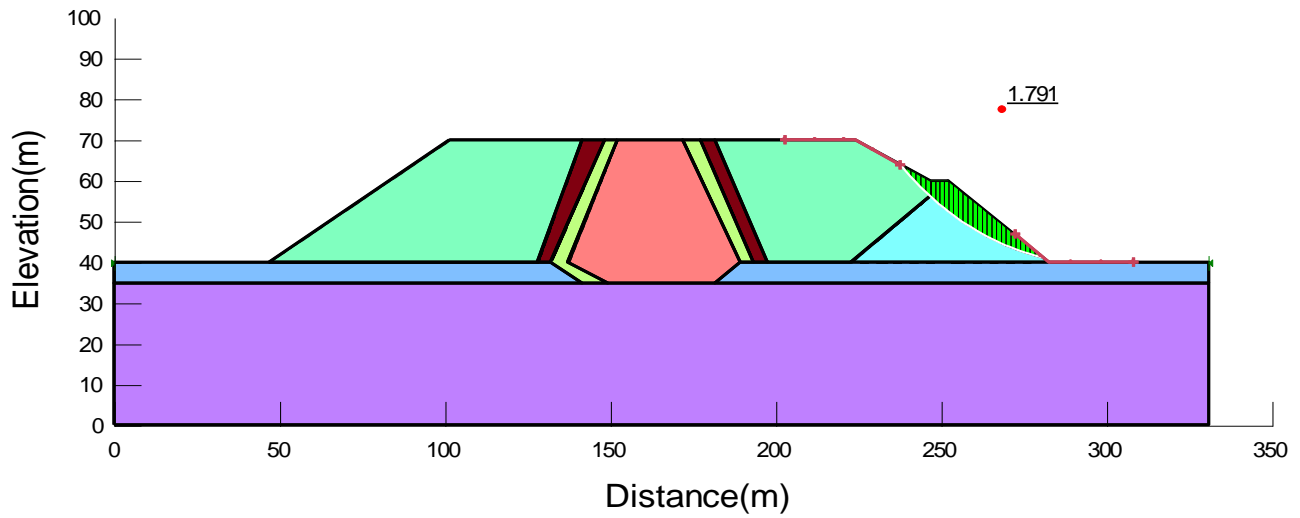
Slope stability during construction without Earthquake CC (D/S)
